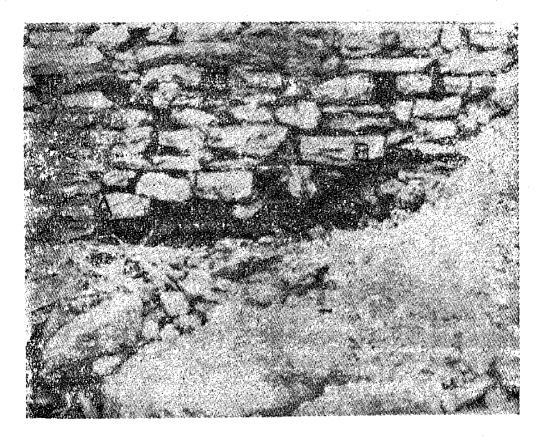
Loss of stones and formation of pockets in retaining wall because of water erosion
